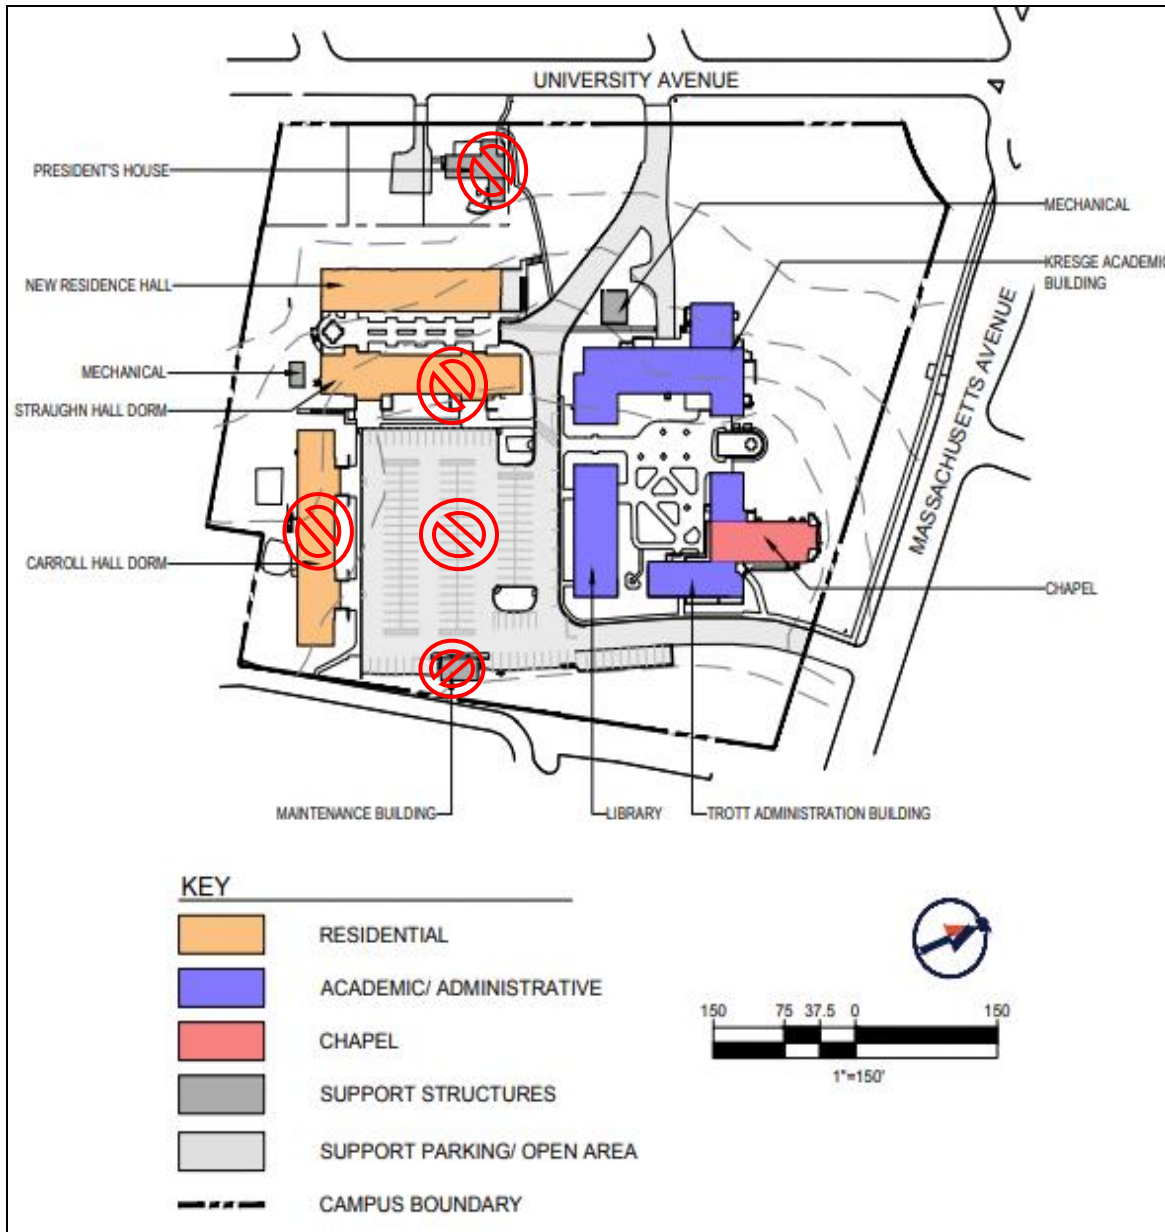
Existing Campus Null sign (X) indicates a building or facility proposed for demolition under proposed campus plan.
